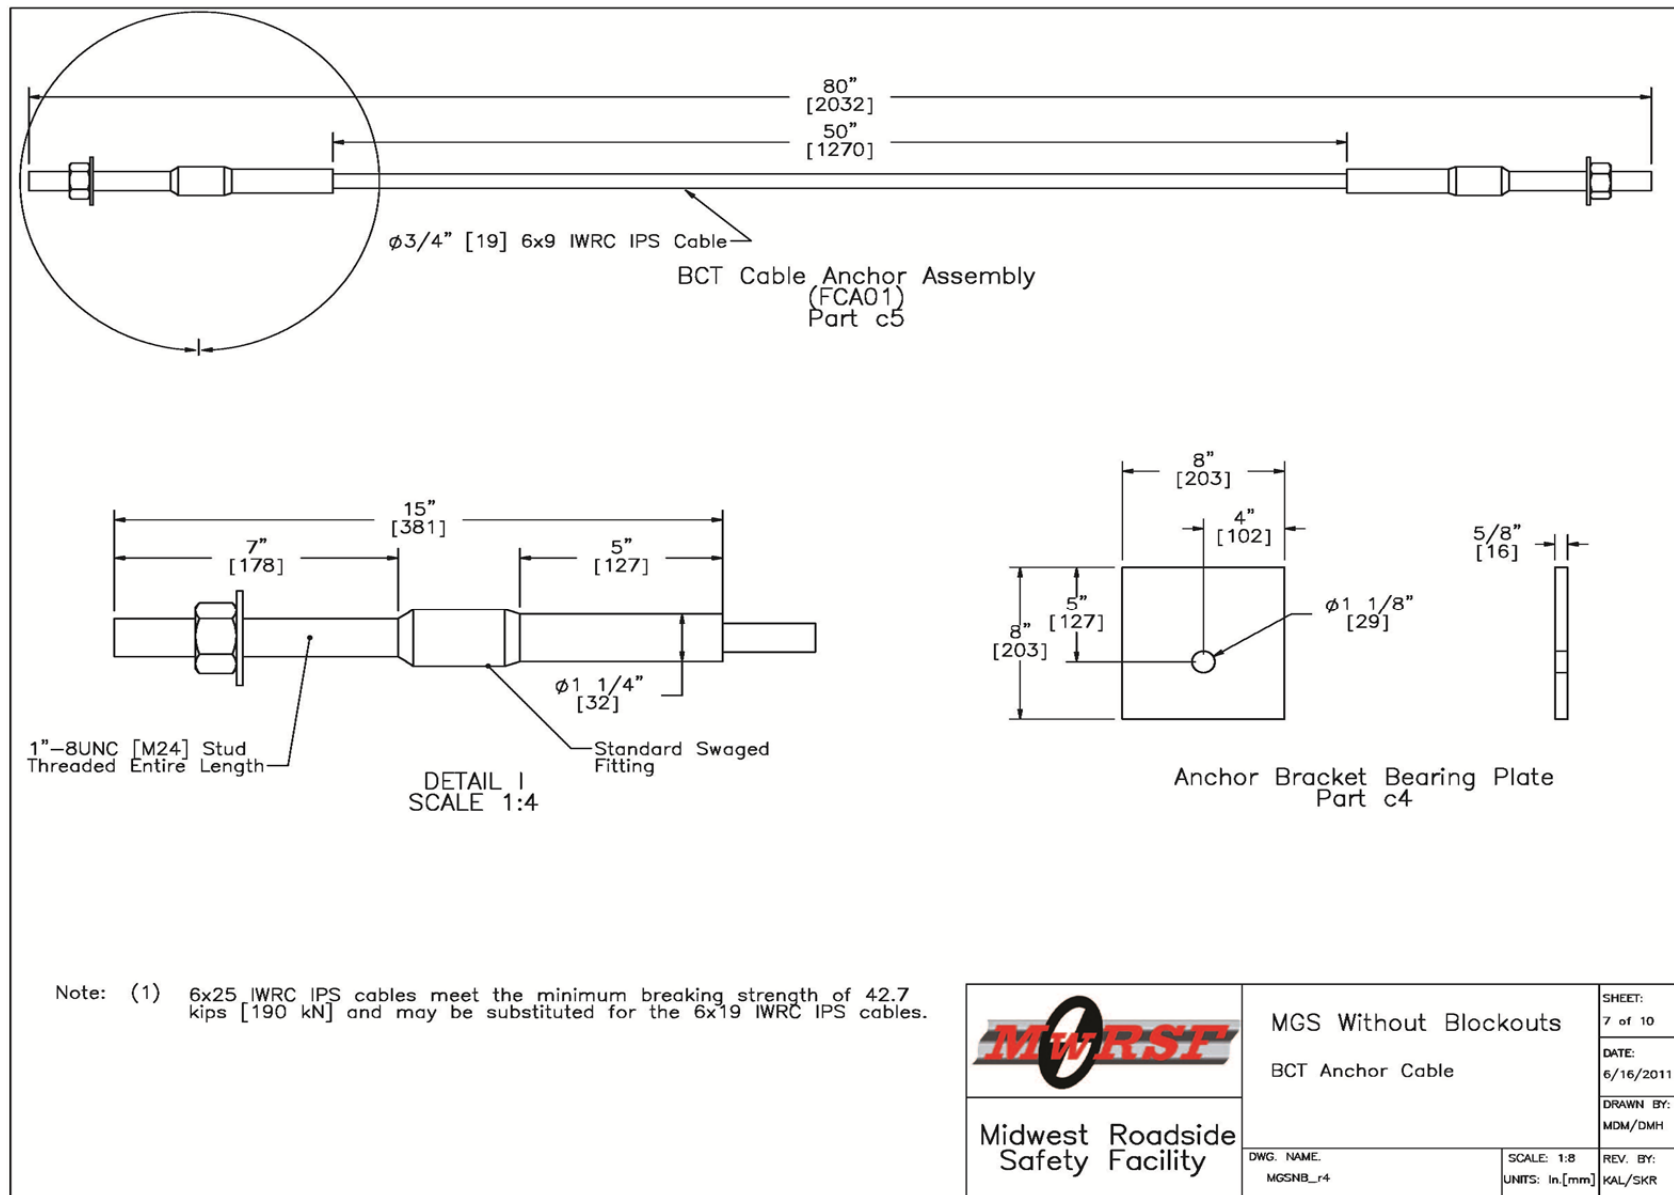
BCT Anchor Cable Details, Test No. MGSNB-1
